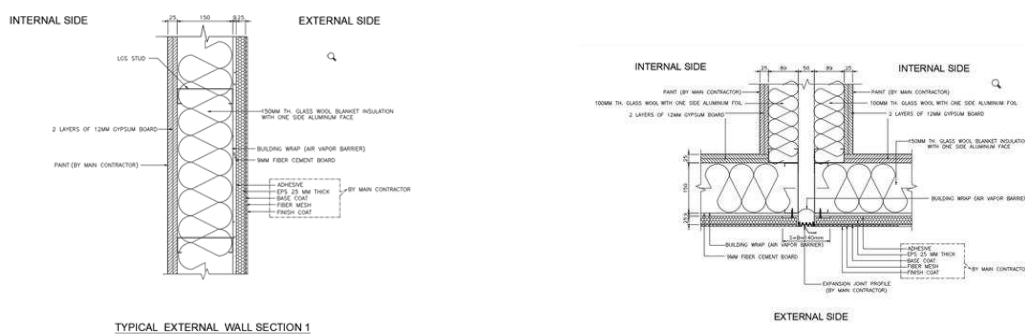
Left: Detailed drawing of as-built exterior wall. Right: Detailed drawing of wall-to-wall junction.
